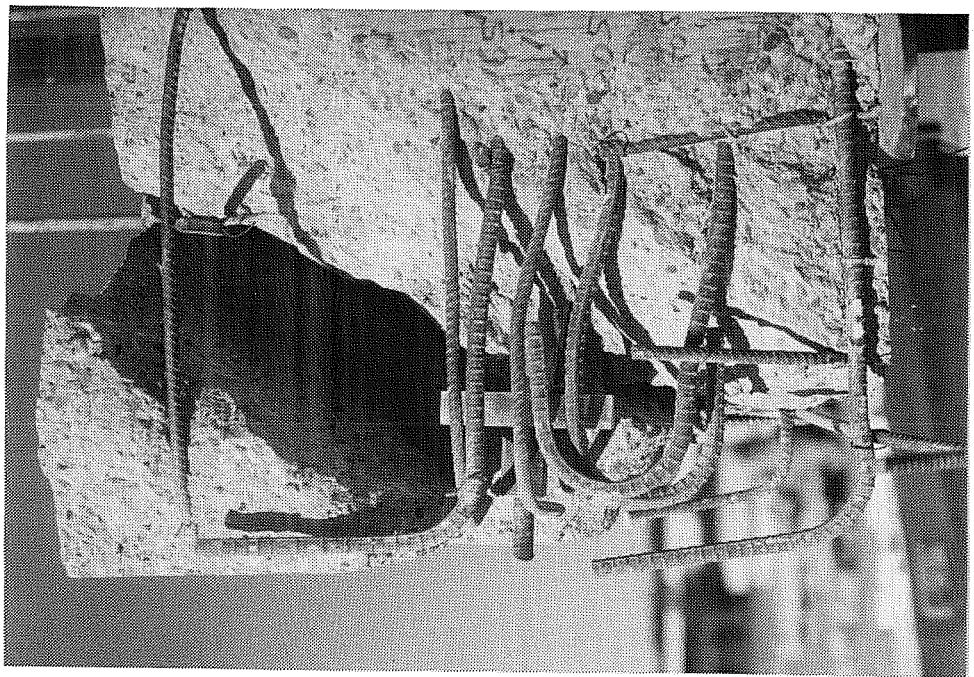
Distorted Reinforcement (Specimen Dia2)
